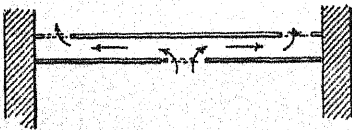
Section through Floor of Corridor, showing Passage of Heated Air.
